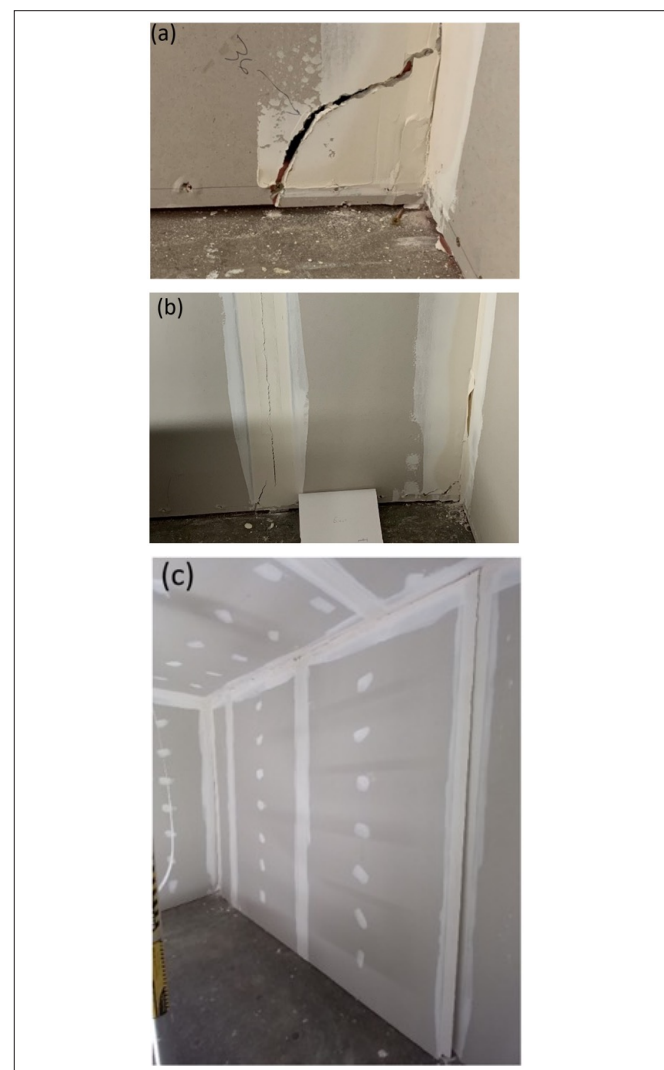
Damage observations of the test structure [88]: (a) local plasterboard damage; (b) failure of vertical sheet joints of plasterboard; (c) out-of-plane buckling of plasterboard.
